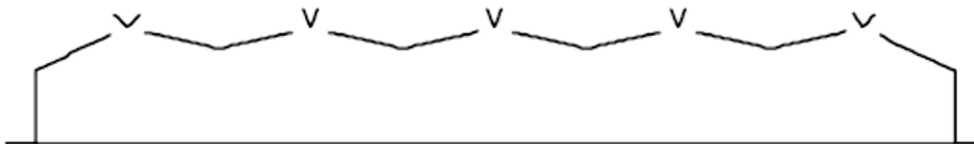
Continuous roof (double) roof ventilation greenhouse (Baeza *et al.*, 2006)
